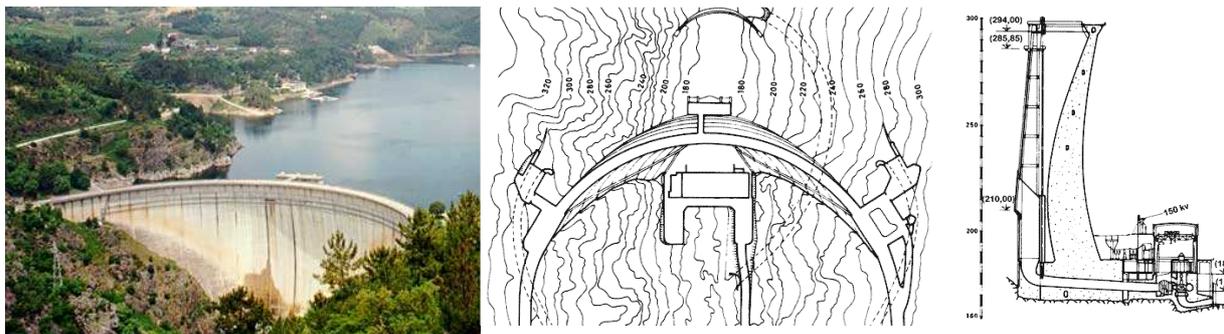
Cabril dam. Plan and central cantilever (with intake tower).
